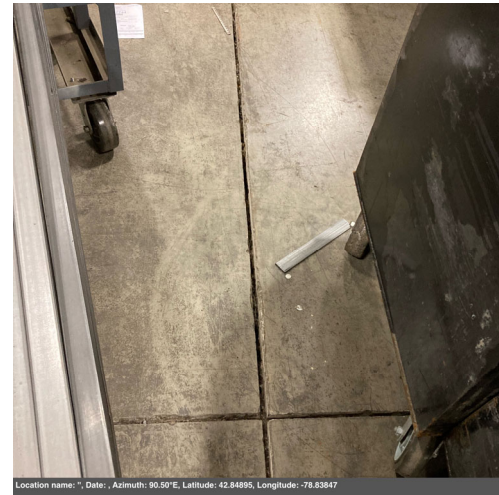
Typical junction of manufacturing space concrete floor slab expansion joints
